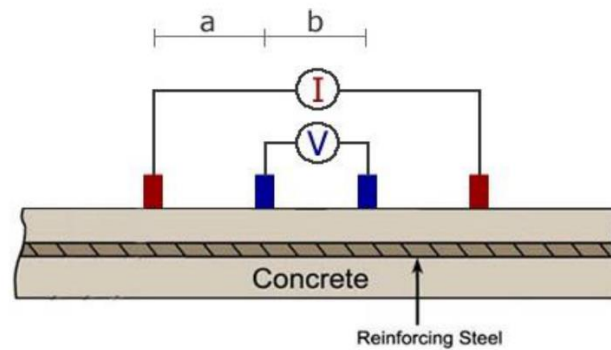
The Configuration of Four Probes on The Concrete Surface for Detecting Rebar Corrosion Inside the Concrete (Based on (Giatec Scientific Inc., 2019)
